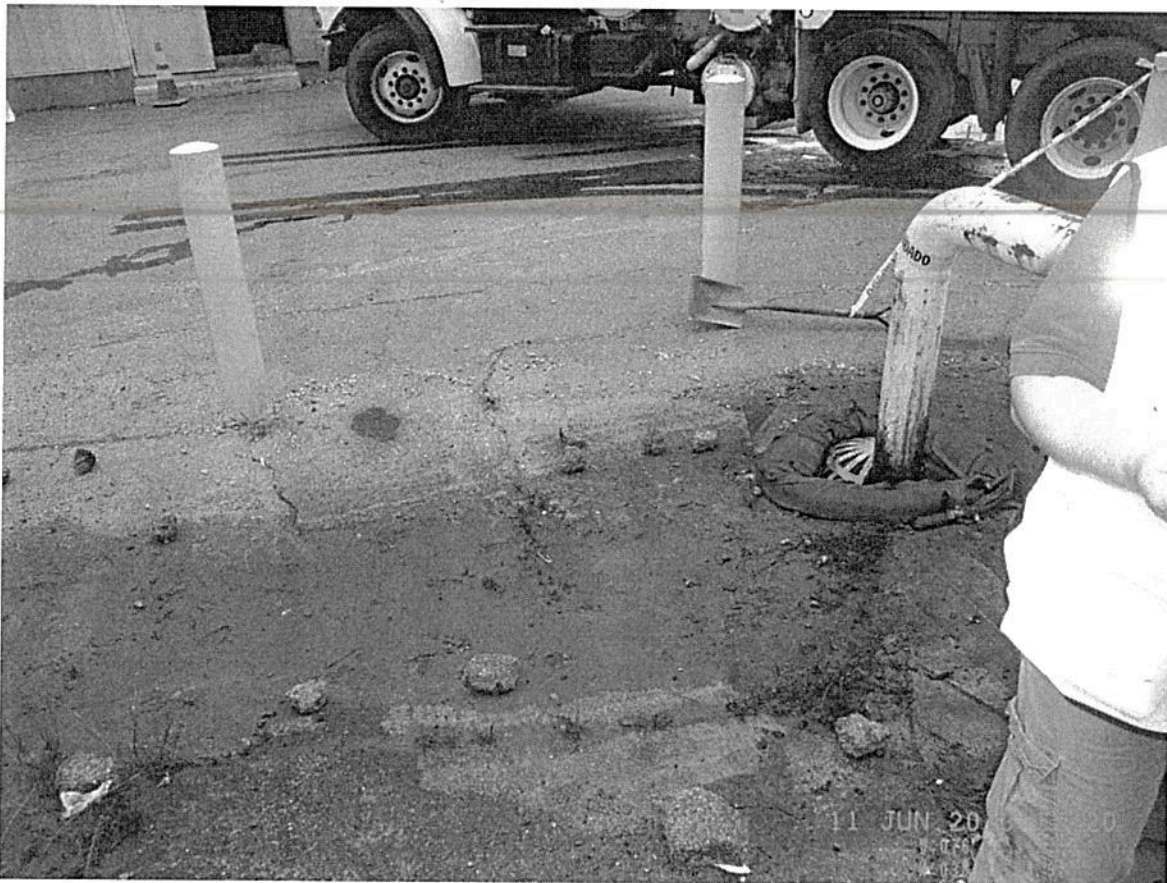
Oiled boom and oil staining the concrete in the vicinity of the white pipe that discharges to Pepco's stormwater system. The pipe originates from a sump in the ash cellar of the power plant.
